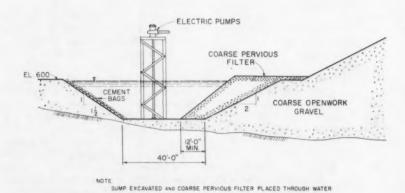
CROSS SECTION MAIN DRAINAGE SUMP ROCKY REACH HYDRO-ELECTRIC PROJECT
